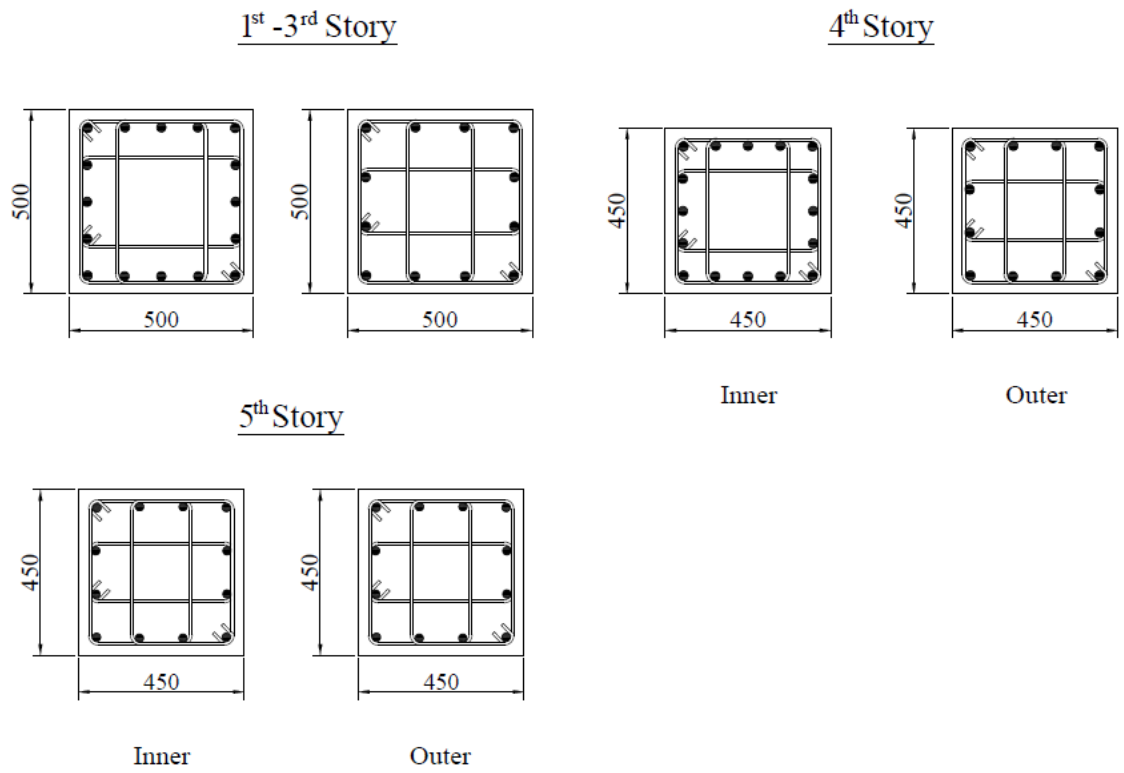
Cross Sections for Columns of 5 Story Irregular Frame
